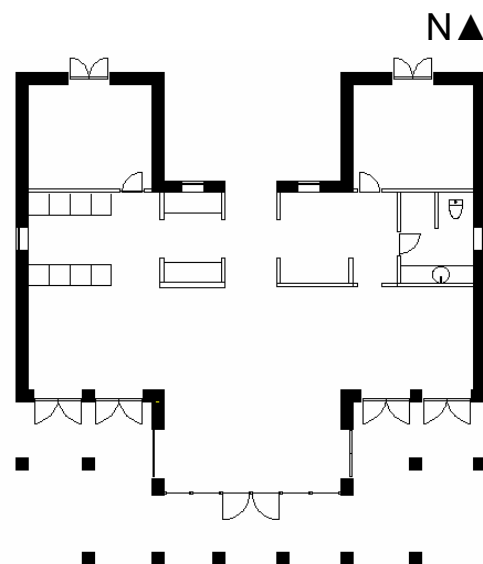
Modified floor plan, with increased amount of windows to the south, west and east. Not to scale
